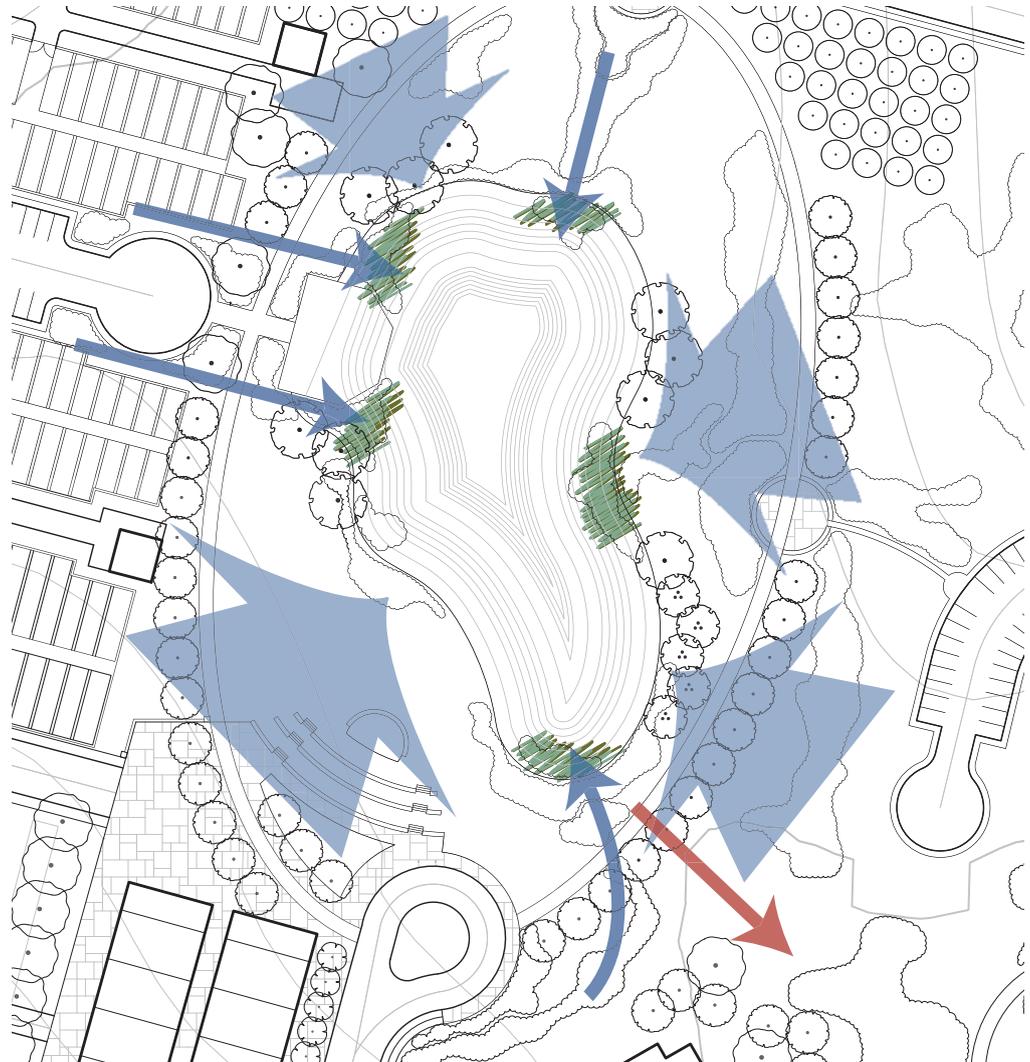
Detail Plan Bio-Retention Pond A3. Produced by Author
